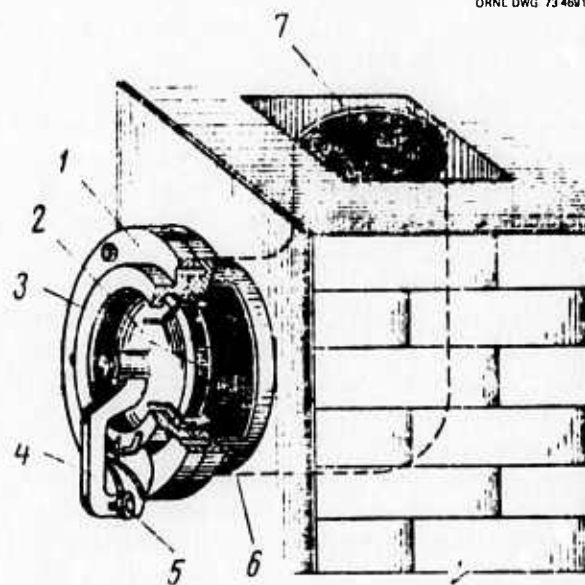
Overpressure valve (diagram of the unit at inlet of bathroom exhaust duct; the arrows show the direction in which the air is moving from the shelter): (1) valve housing; (2) disk; (3) rubber lining; (4) lever connecting the disk to the valve housing; (5) counterweight system for regulating the disk position; (6) metal pipe; (7) exhaust duct.
